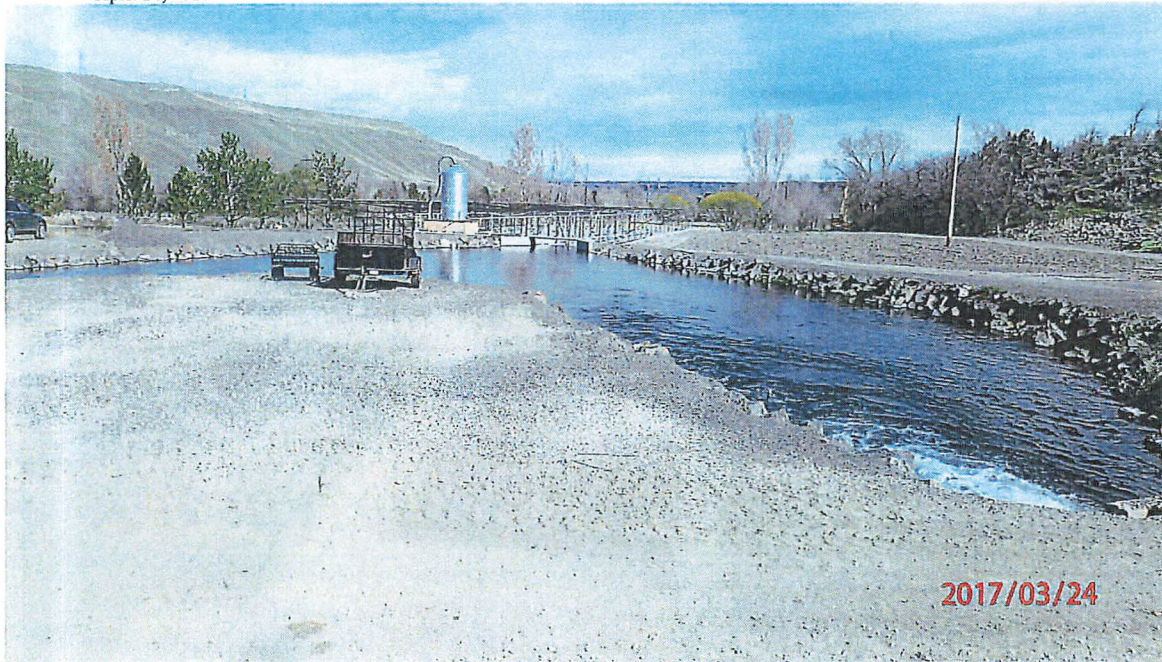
Waypoint 182 - Overview of irrigation ditch that receives discharge water from Billingsley Bay, looking southwest.
